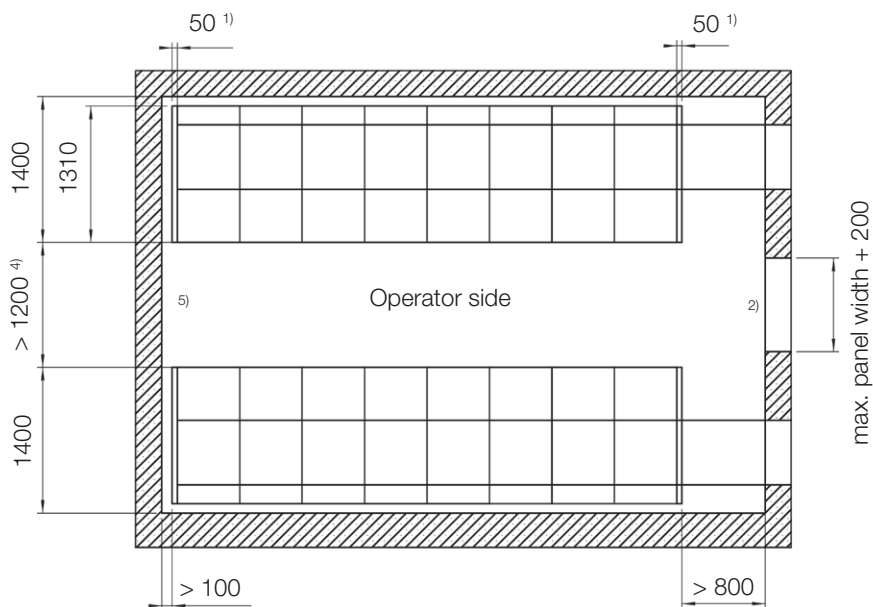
Wall mounting installation, example of a double row installation (Top view, dimensions in mm)
